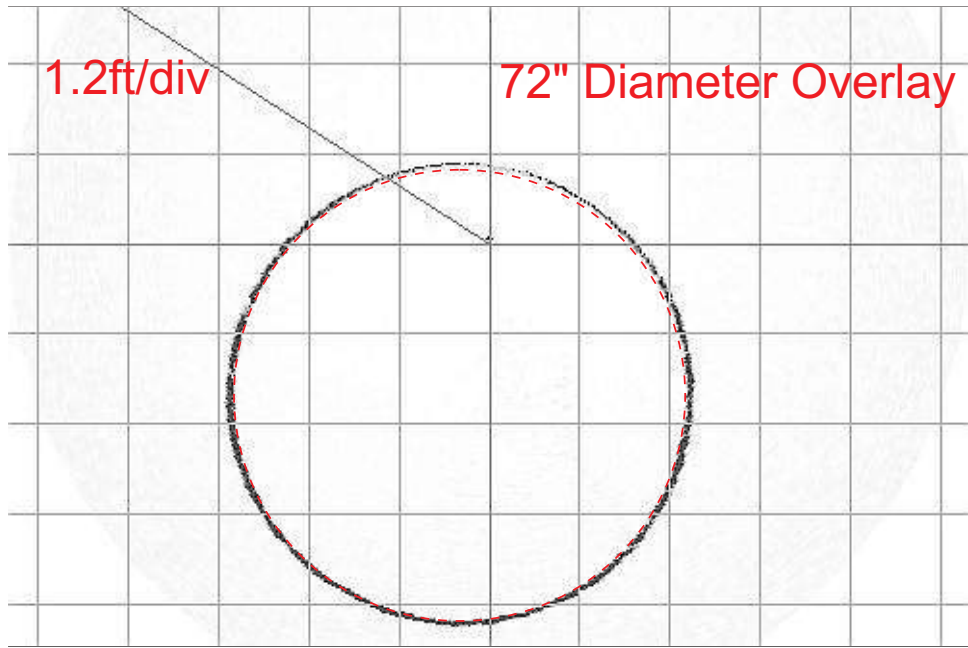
Sonar Profile 17 - 0 feet from Access Point 1.
